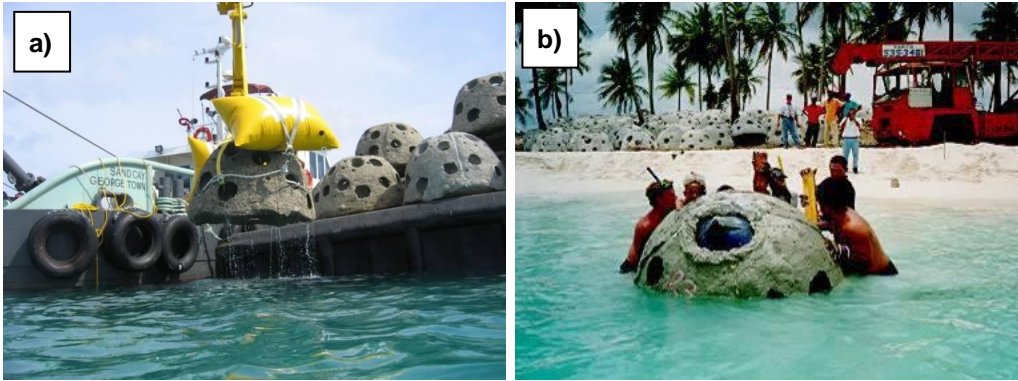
a) Example of lift bag (Arnouil, 2008); b) Arrangement of Reef Ball with inflated central buoy (Harris, 2007a).
